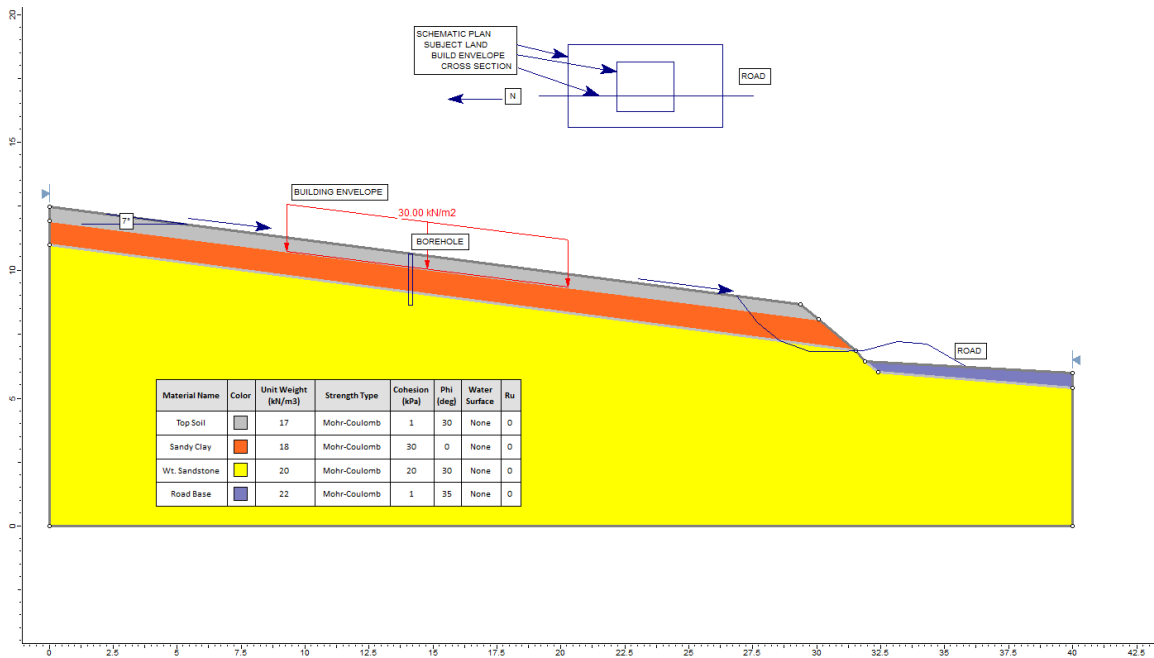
Slope model with proposed build envelope and possible failure modes.(Author).
